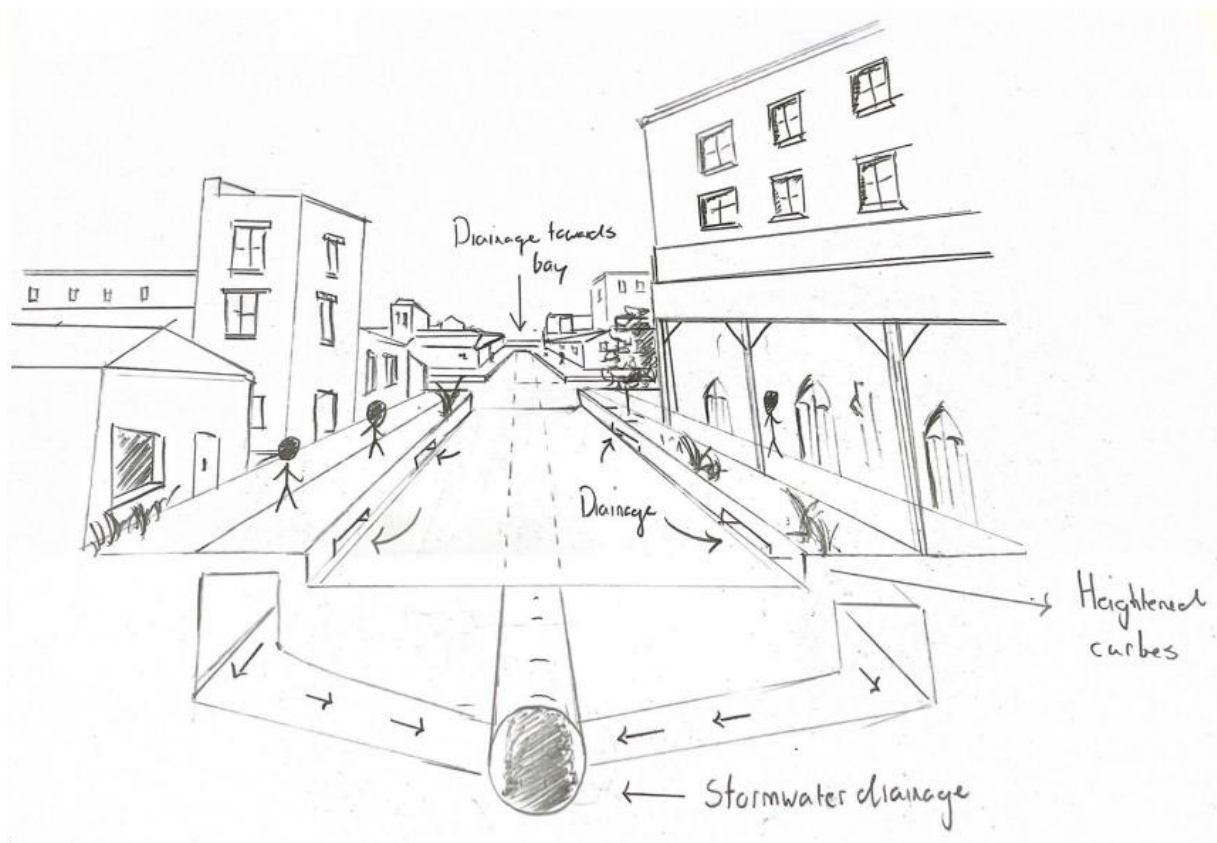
Engineering behind the landscape: the current drainage system in Galveston
